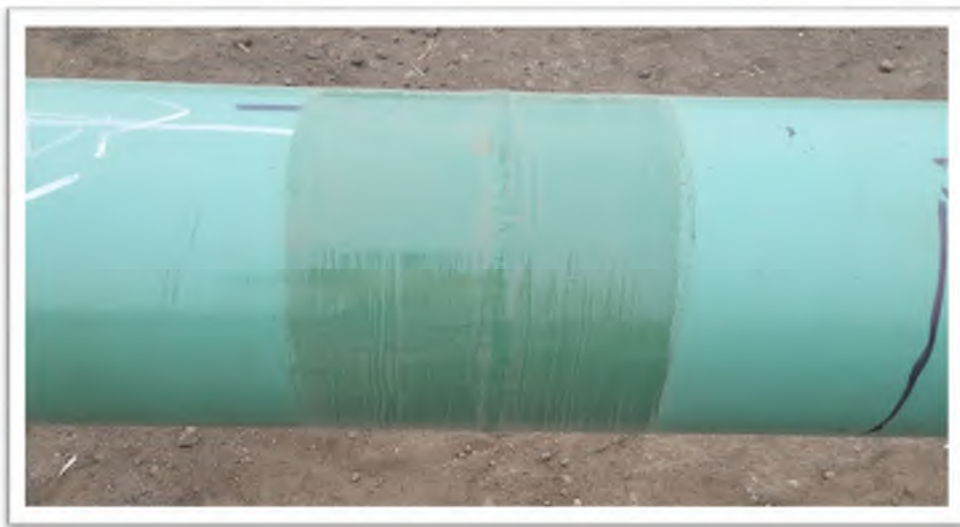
View of completed weld on 10" pipeline assembled above ground.
